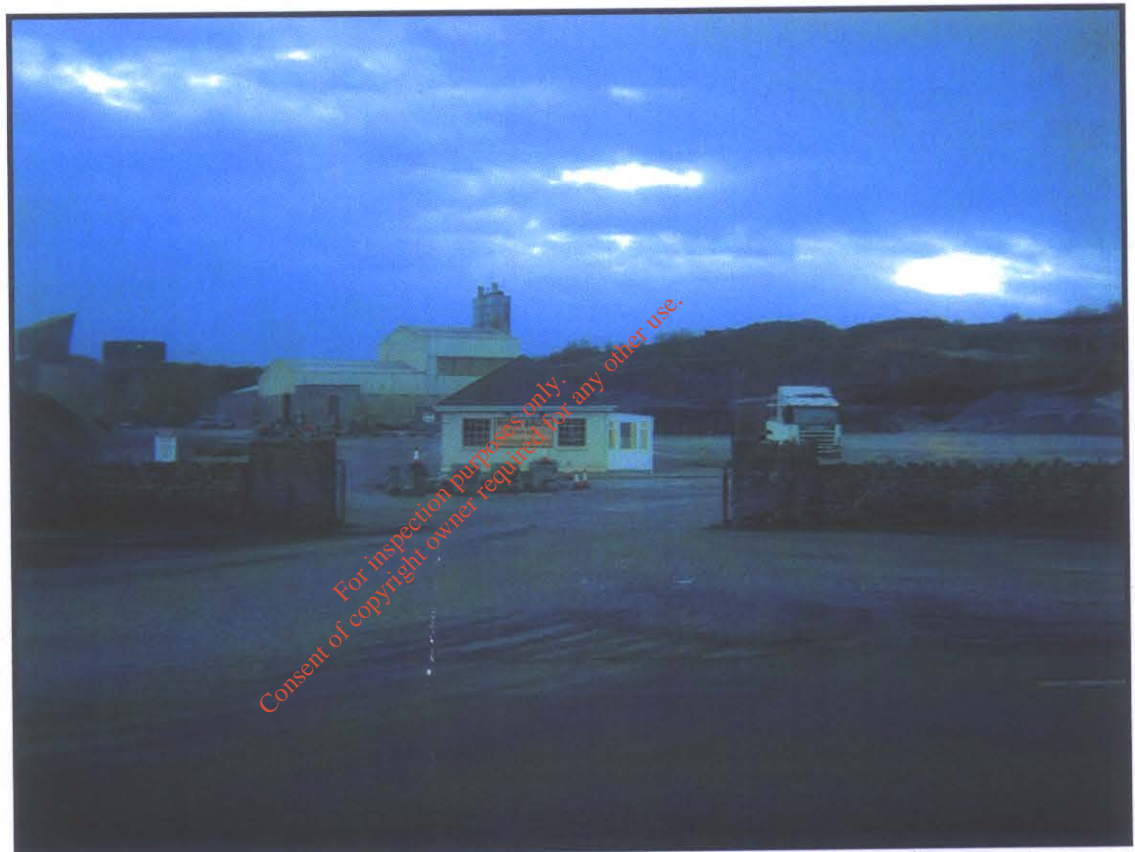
/1: Existing Site Entrance (12m off the R476)
